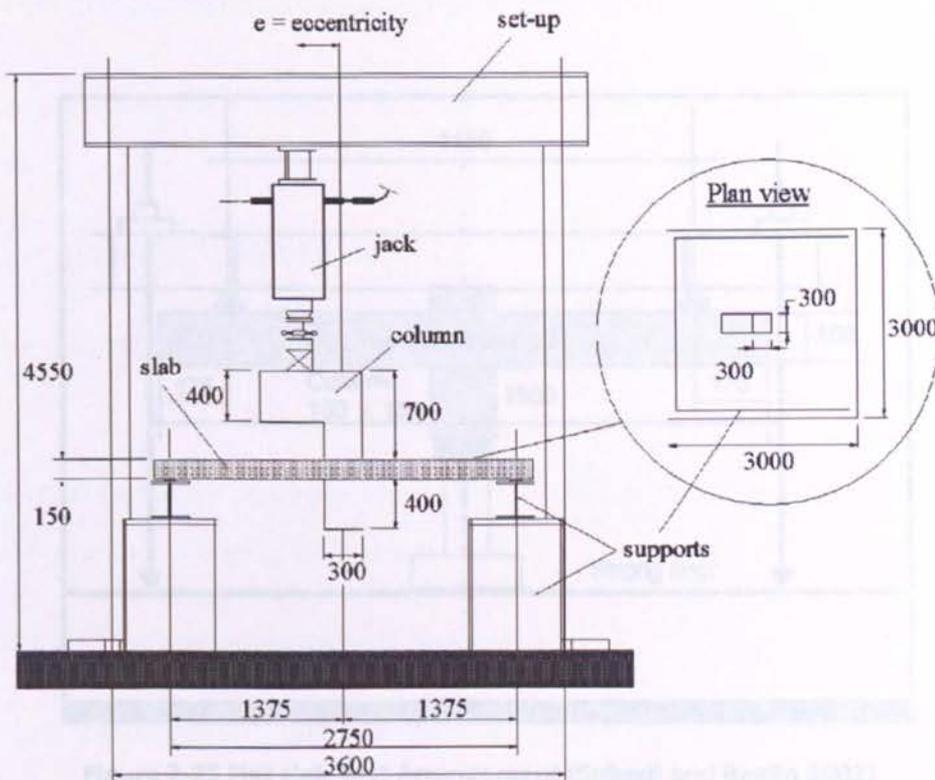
Testing a concrete flat slab specimen (Kruger, Burder & Favre 1998)
